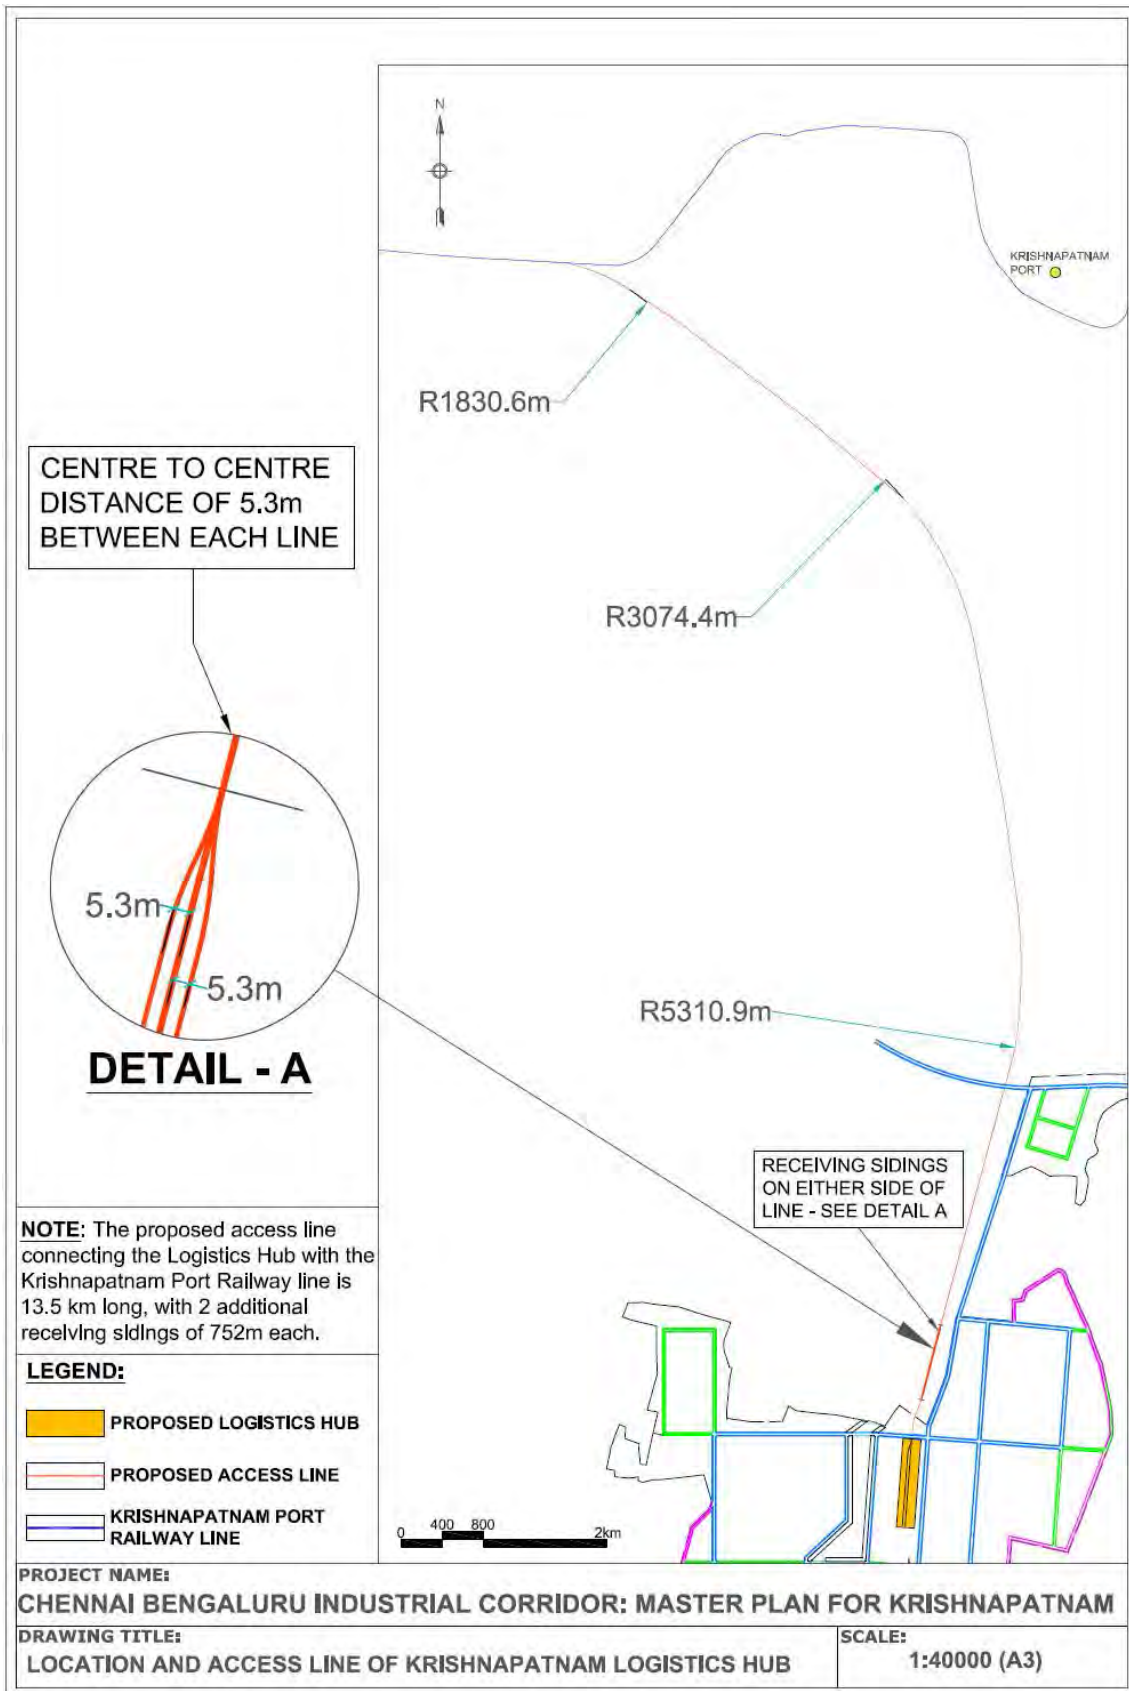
Krishnapatnam Node – Layout of proposed rail access line and reception sidings
